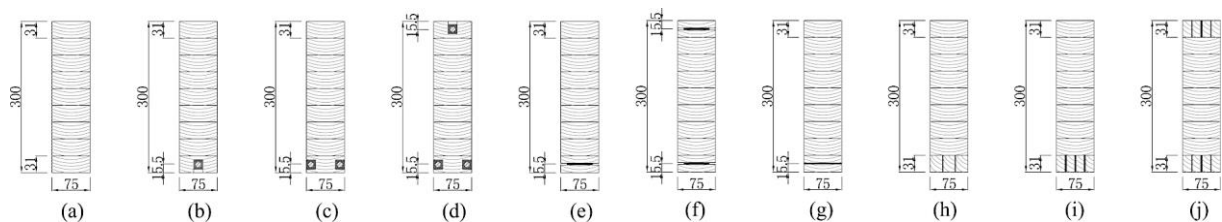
Reinforcement schemes studied by (Yang et al. 2016).
